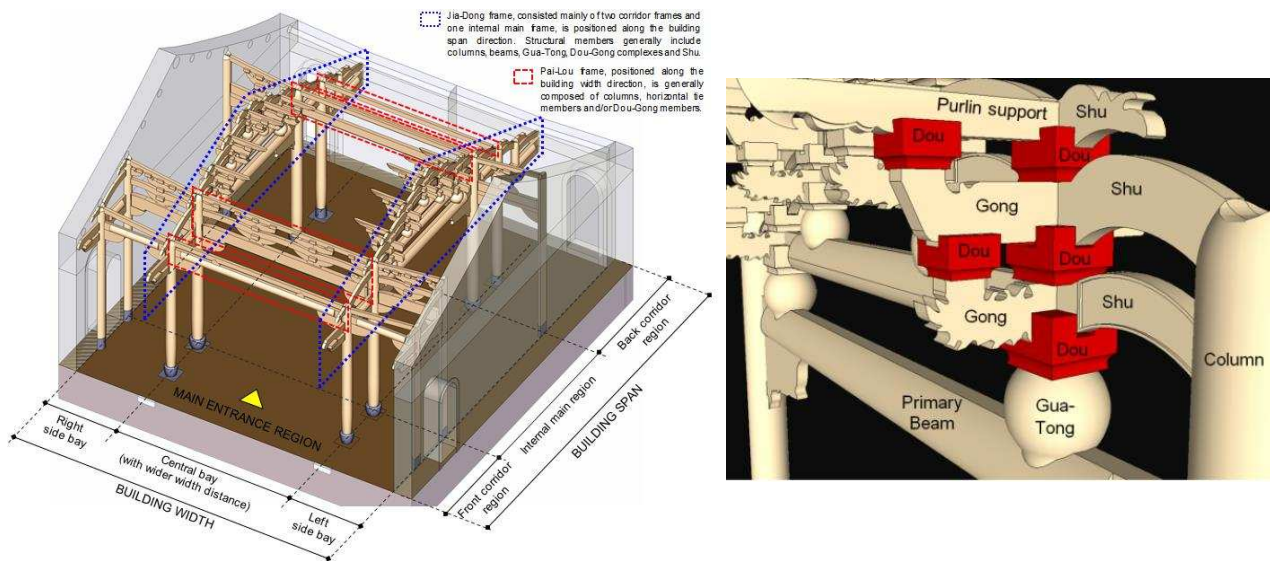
A typical Taiwanese Dieh-Dou timber building layout design [1] and naming of key structural members.
